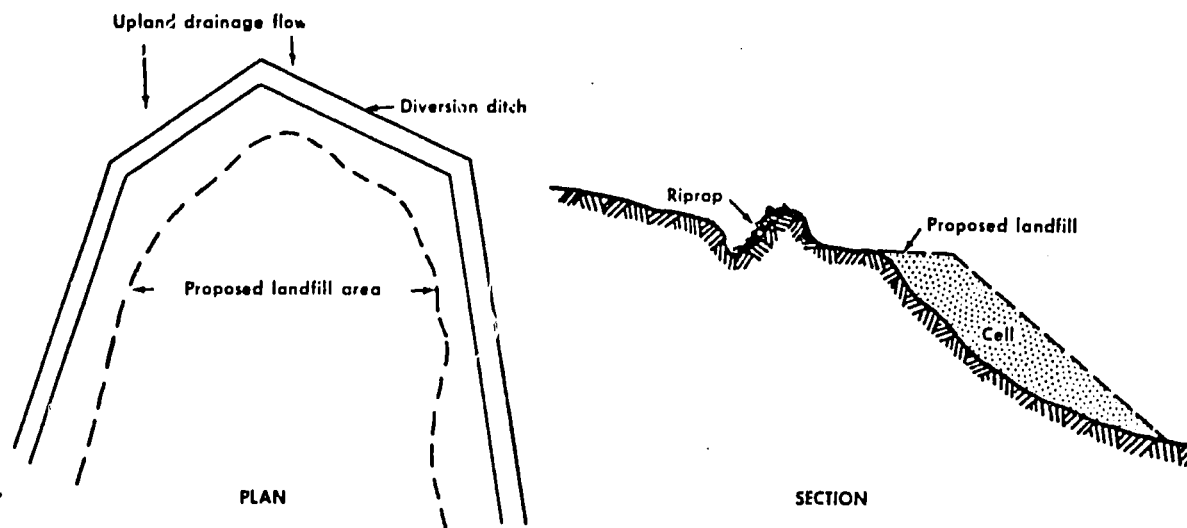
Plan and section views of the use of a diversion ditch to transmit upland drainage around a sanitary landfill.
